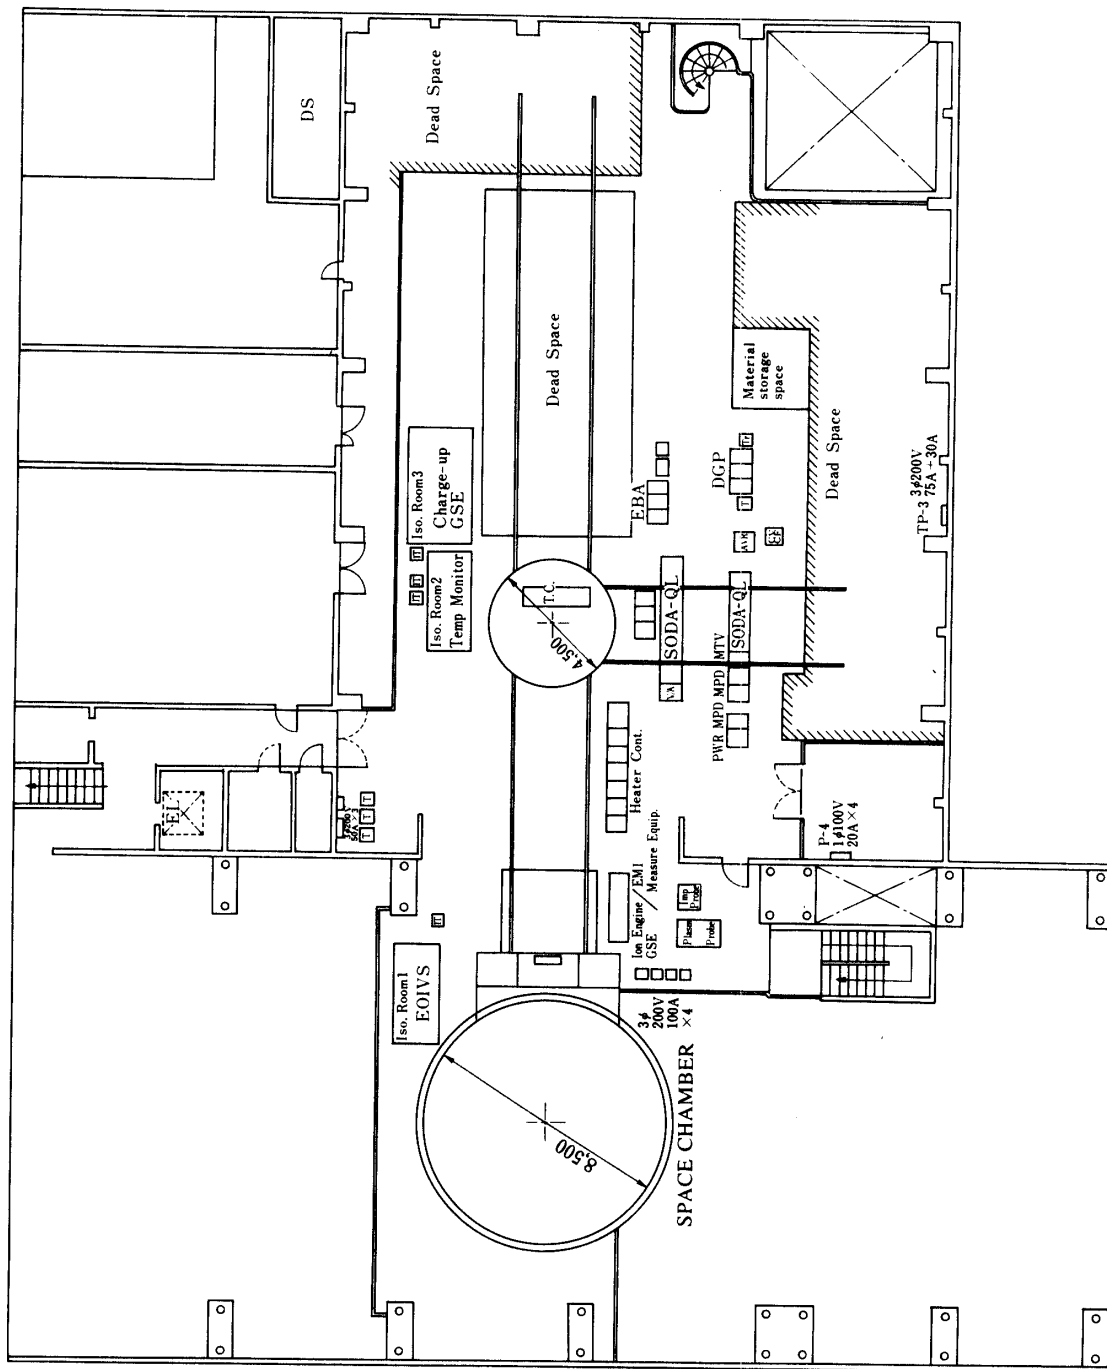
SEPAC NASDA CHAMBER TEST Floor Layout for Charge-up/FO Ope Test.
